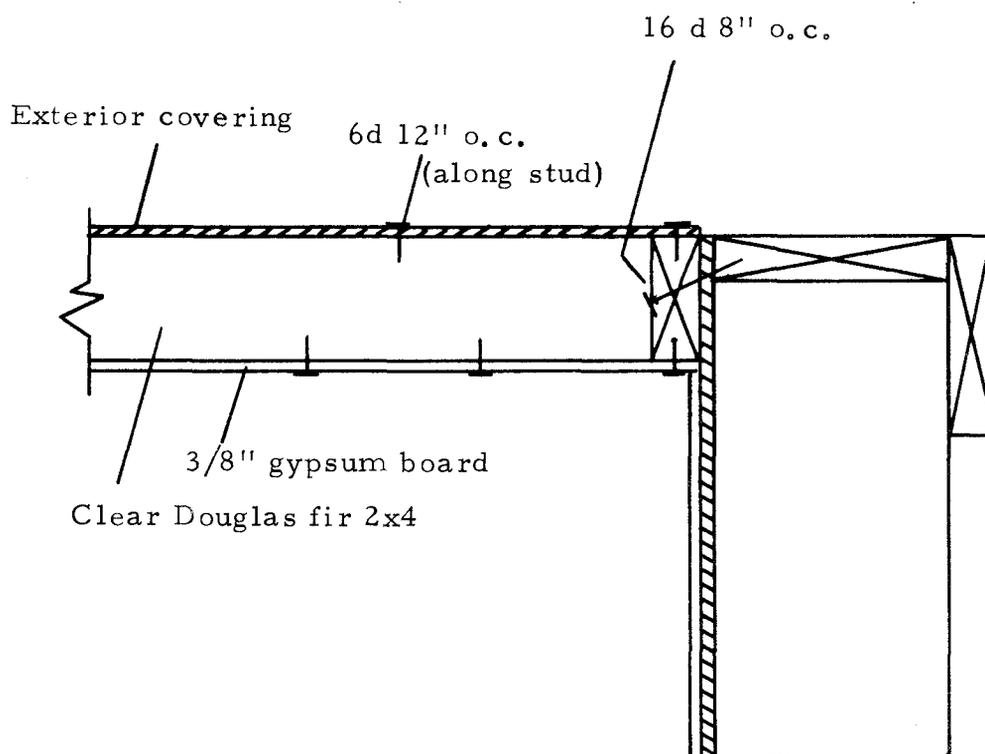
Wall construction type II where exterior covering does not overlap joist header and one additional 16d nail holds soleplate to floor.
